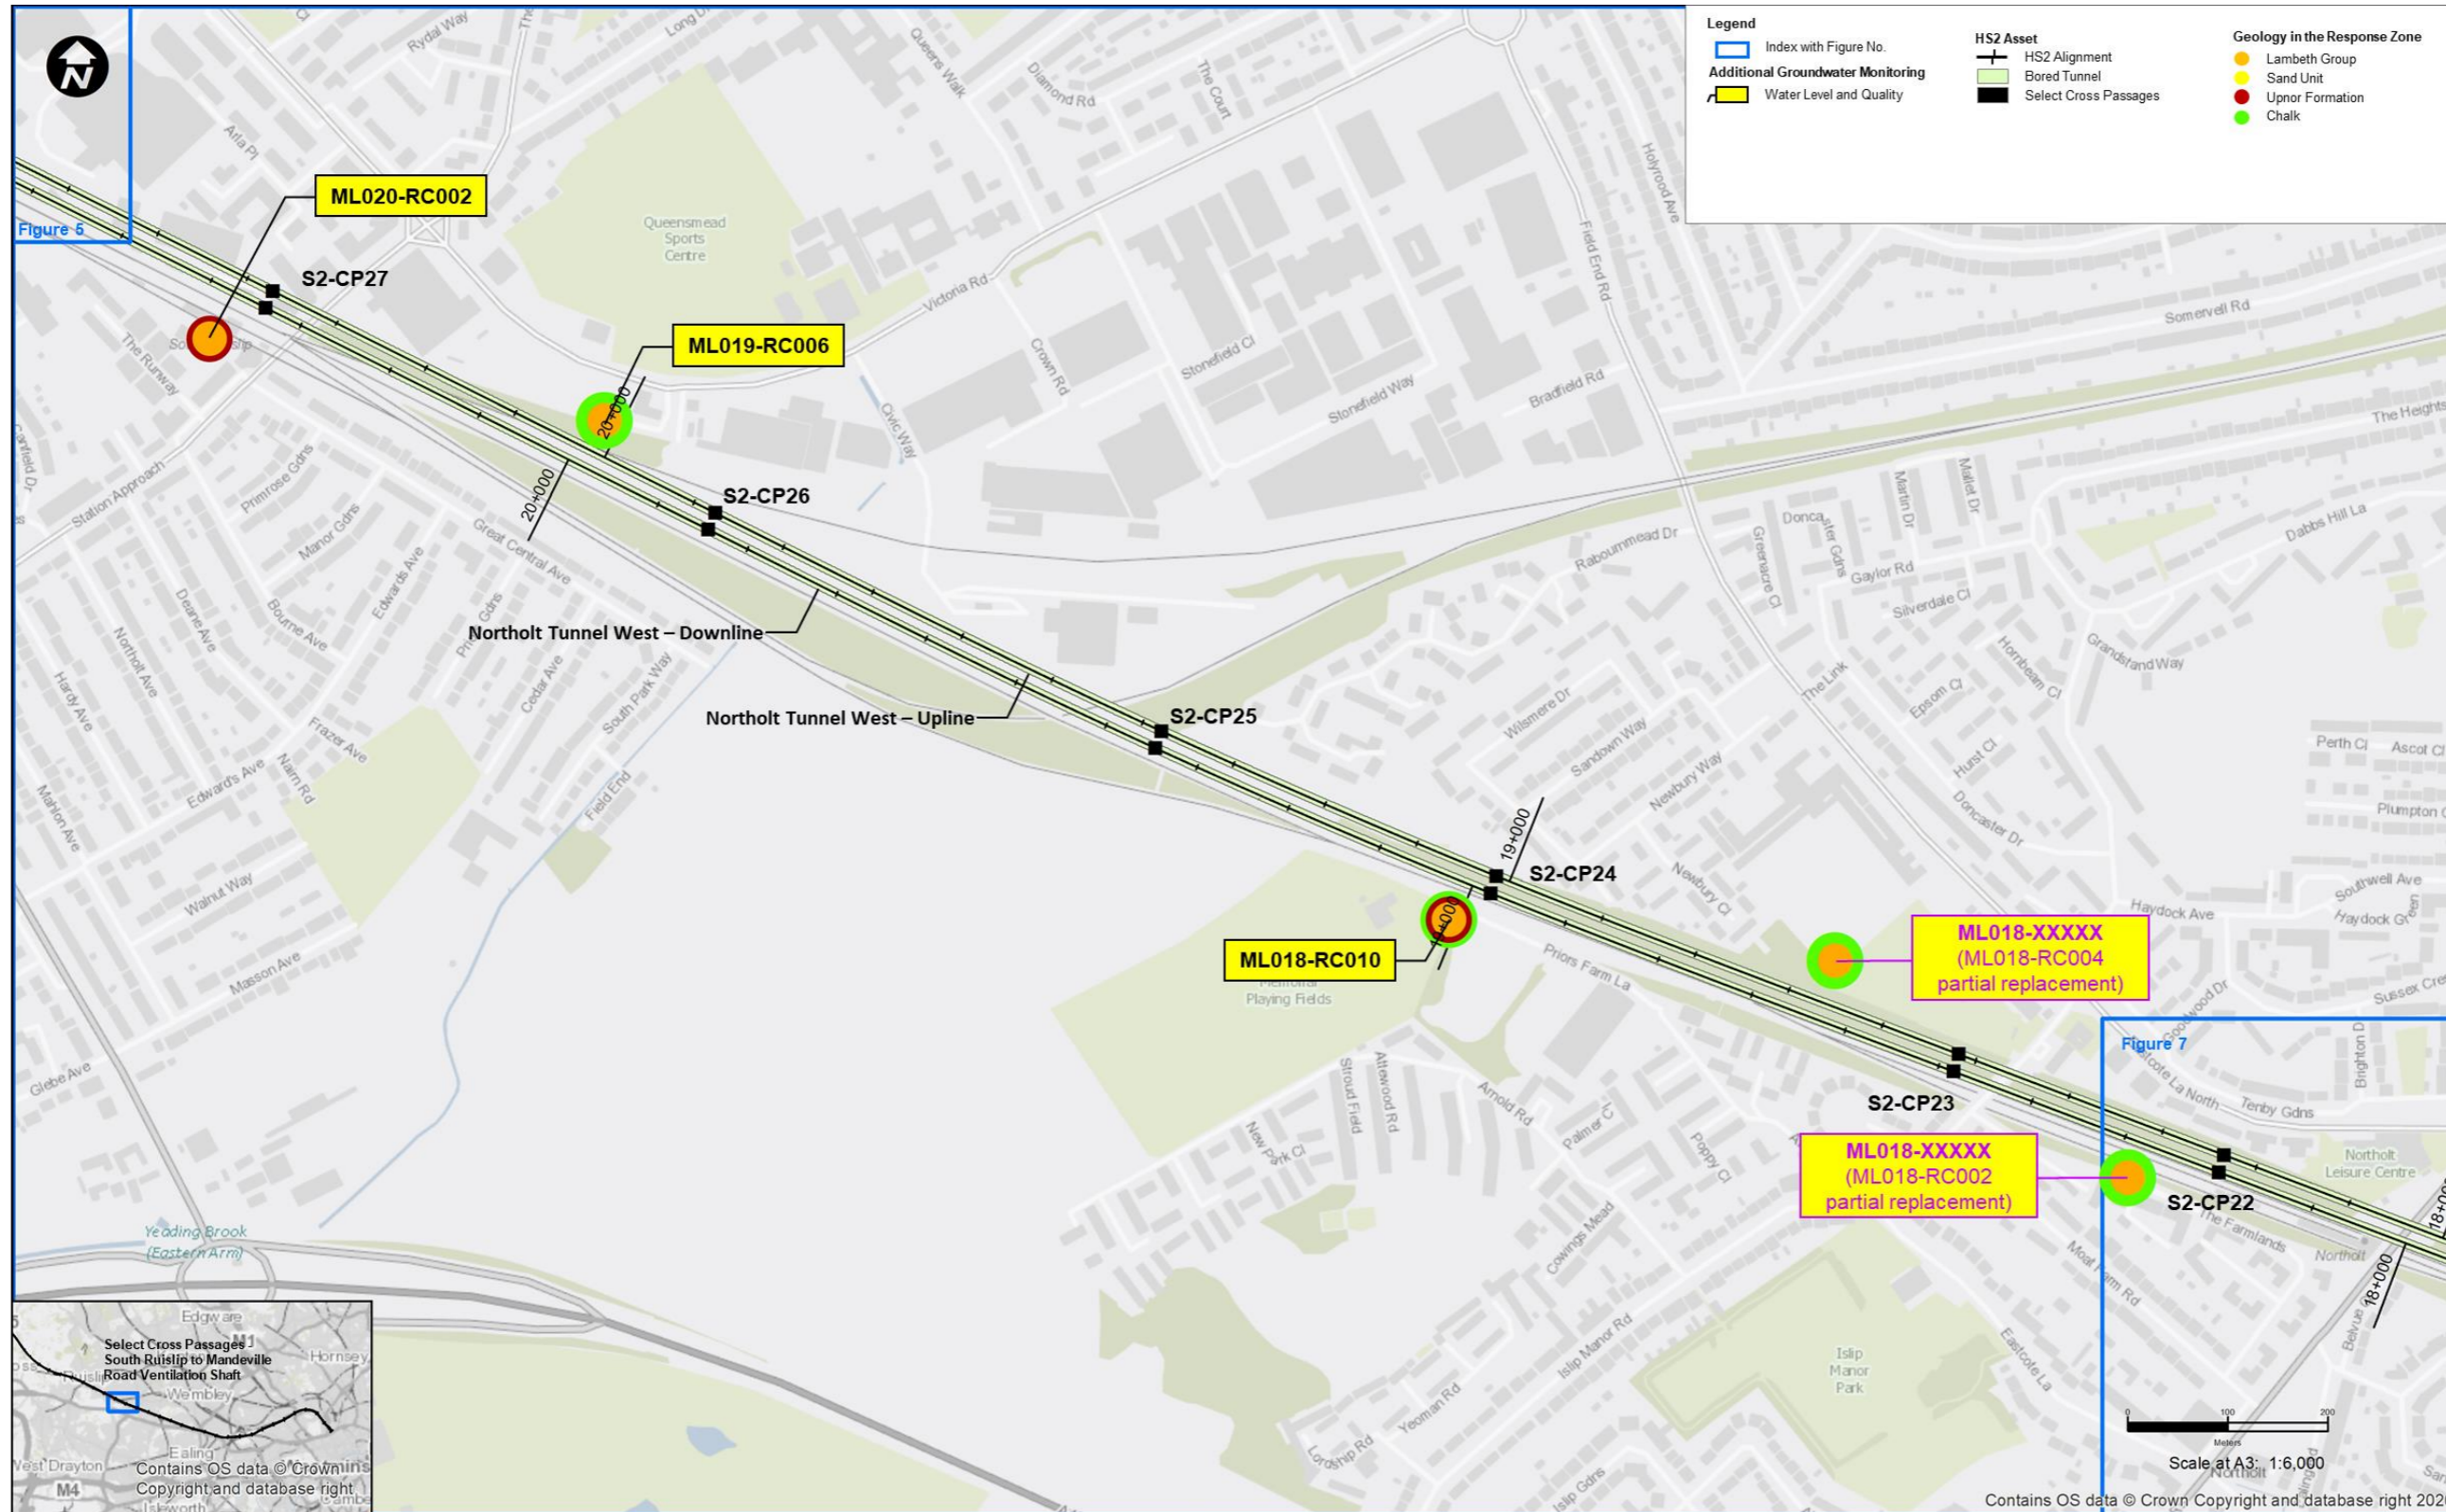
Groundwater Monitoring Plan - Cross Passages and Tunnels - South Ruislip to Mandeville Road Ventilation Shaft
